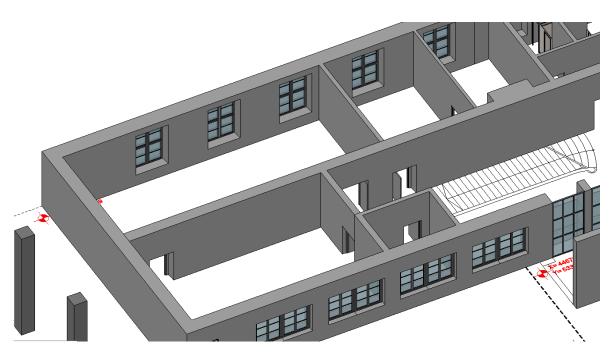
The close interior view of a floor (of the CAD building model).
